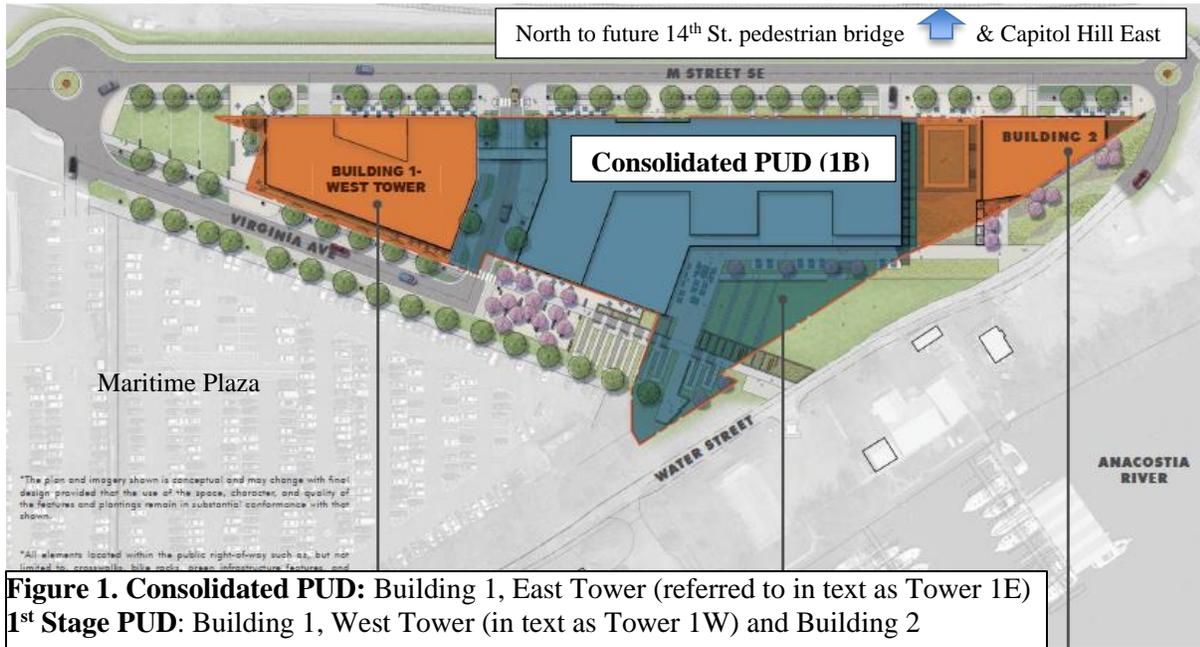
Consolidated PUD: Building 1, East Tower (referred to in text as Tower 1E)
